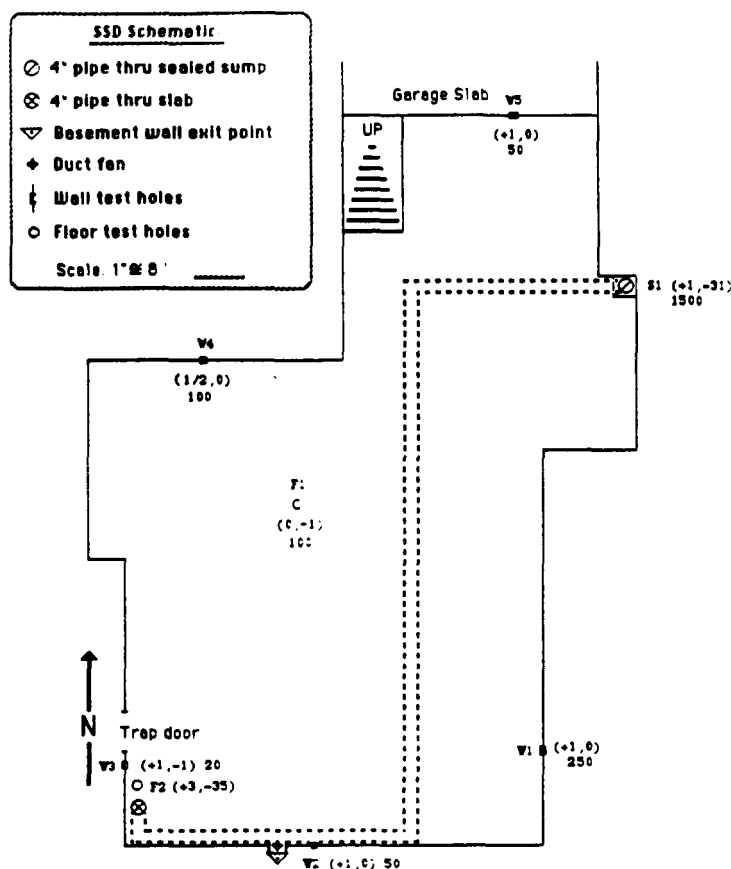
Basement floor plan with SSD mitigation system and test holes. The floor plan represents two elevations; the basement slab is six feet below grade and the garage slab is at grade level. The mitigation duct system is outlined with dashed lines, with a penetration into the subslab in the southwest corner and one another in the sump. The sump was covered and a submersible sump pump installed. The duct system exits the building through the basement wall. There are eight test locations: five wall test holes connecting the basement to the inner block walls labeled W1 and W5, two slab test holes connecting the basement to the subslab labeled F1 and F2, and the sump. All wall holes are 3 1/2-4' above the slab. Each hole is labeled with two pressure differences, in Pascals, given in parenthesis. The first pressure difference across the test hole is recorded under ambient conditions, and the second one is recorded during operation of the mitigation system. Radon concentrations (in pCi/L) obtained by grab sampling are printed under the pressures.
